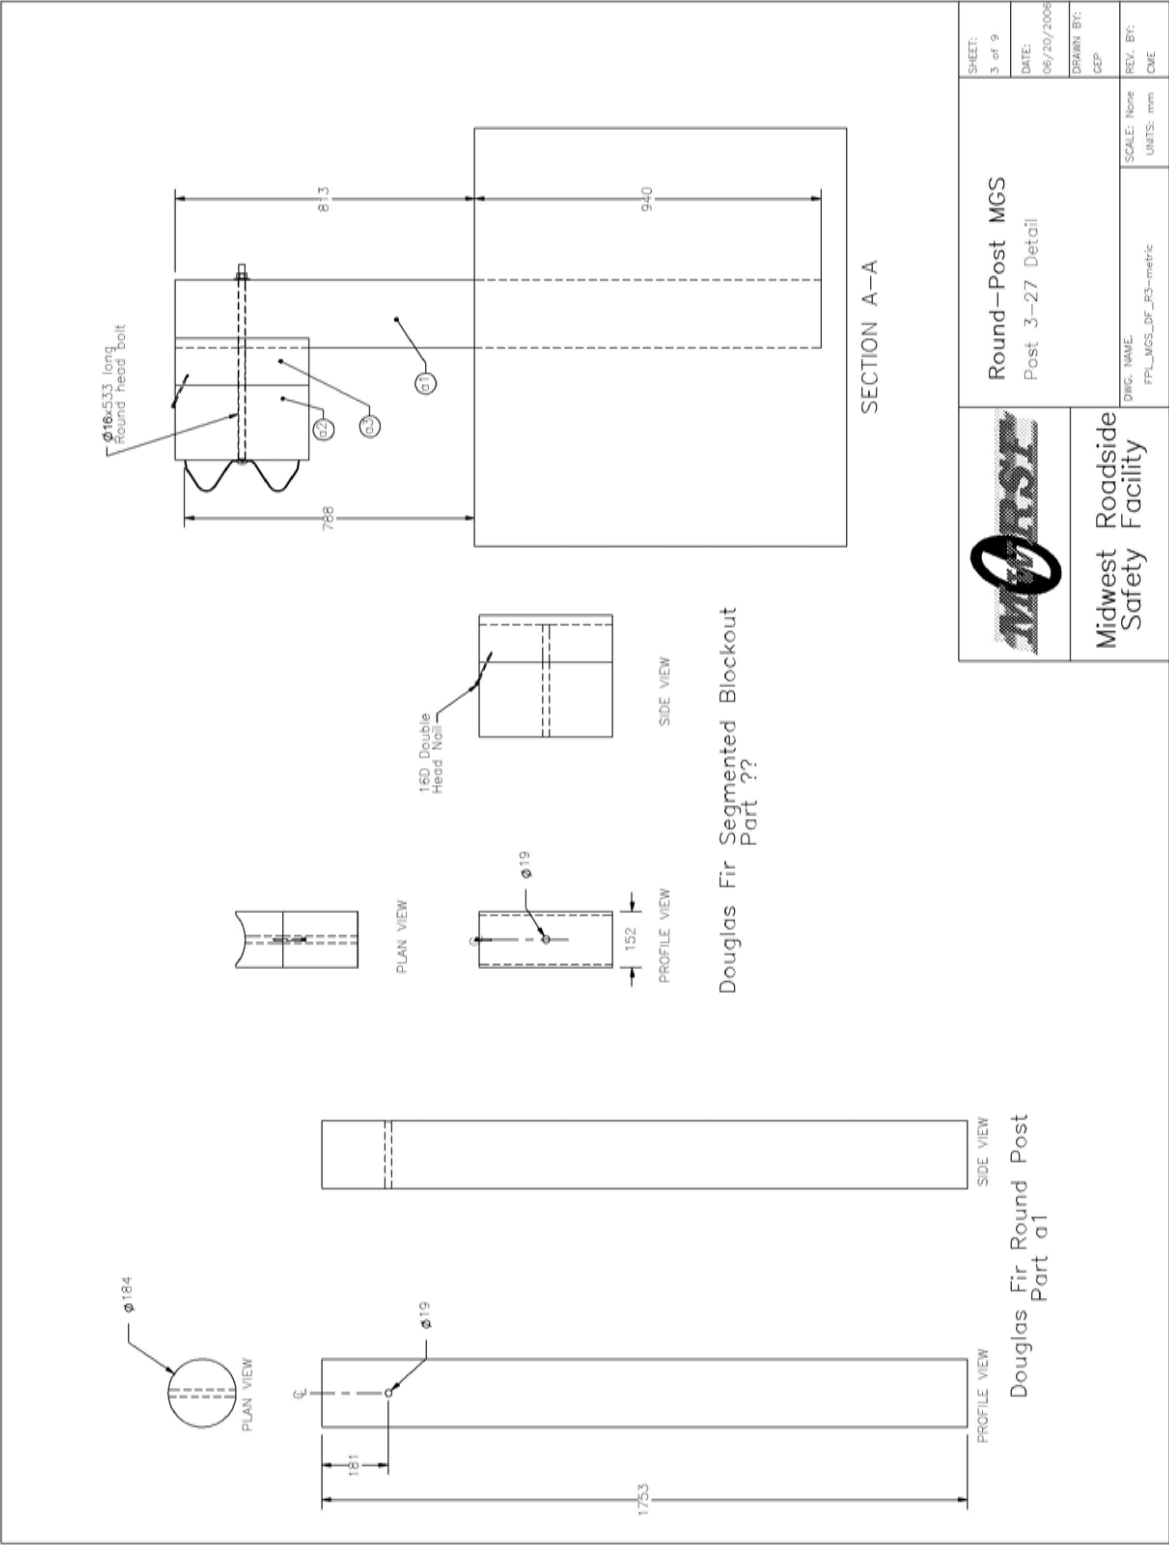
MGS Round Post Douglas Fir Details – Post Detail
